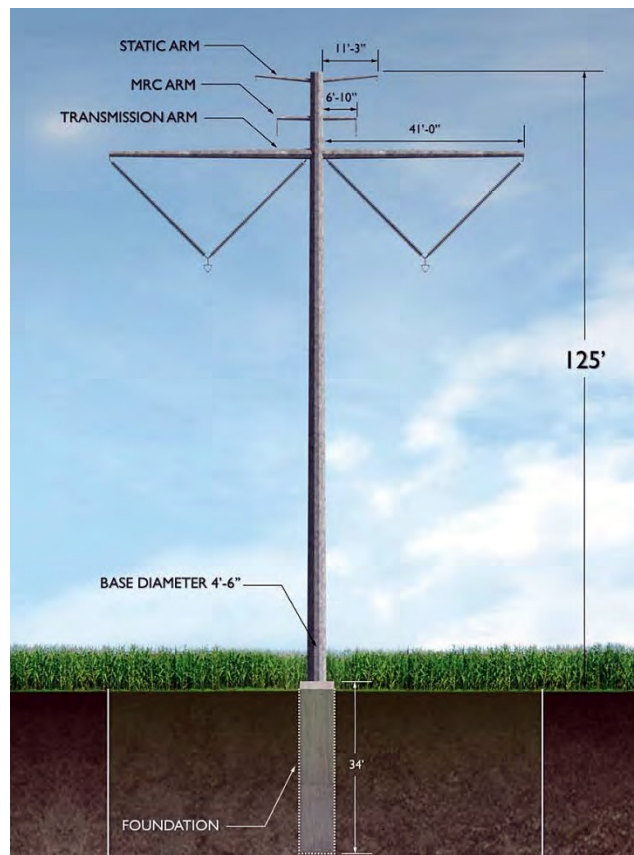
Typical overhead pole structure, 120-160 ft height and 4-7 structures per mile.
